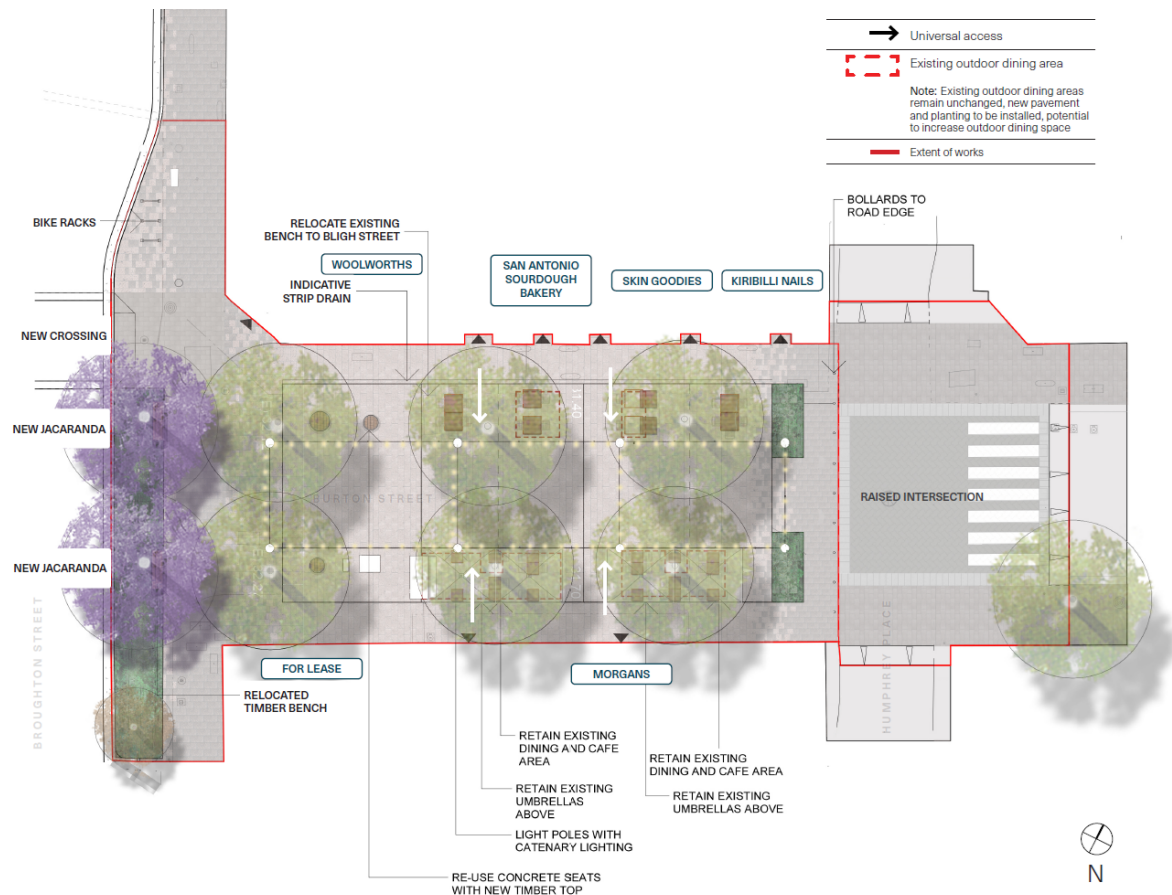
Burton Street Option 2 Layout - Stepped level platforms
